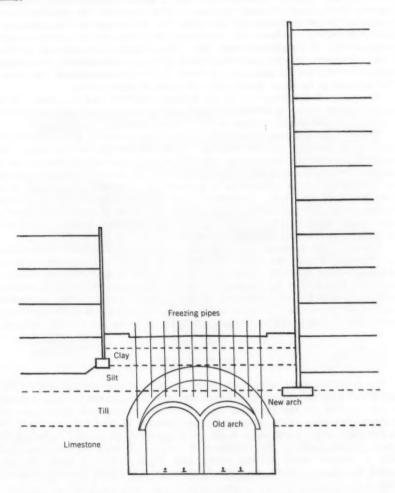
CROSS SECTION SHOWING POSITIONS OF SOIL LAYERS AND BUILDINGS ON EITHER SIDE OF THE TUNNEL.
